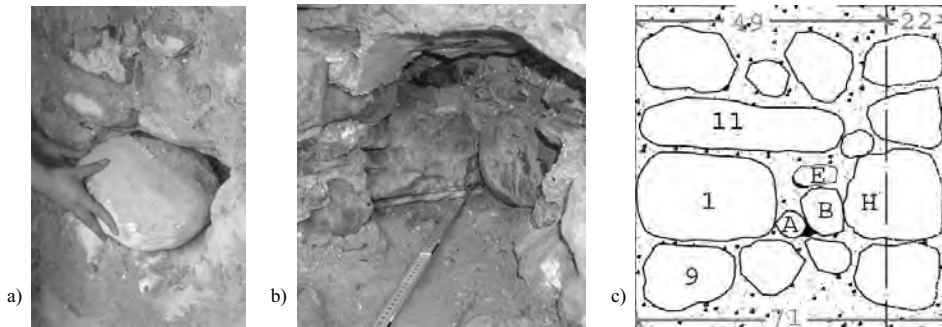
Survey of the wall section c) by removal of few stones (a,b).
